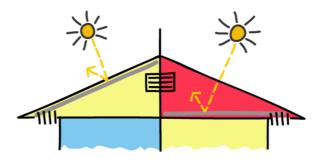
Reflective foil under the roof sheeting (www.townsville.qld.gov.au/resources)
